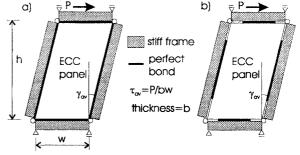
Simplified model of a single ECC panel (deformed configuration); a) case BC1; b) case BC2
